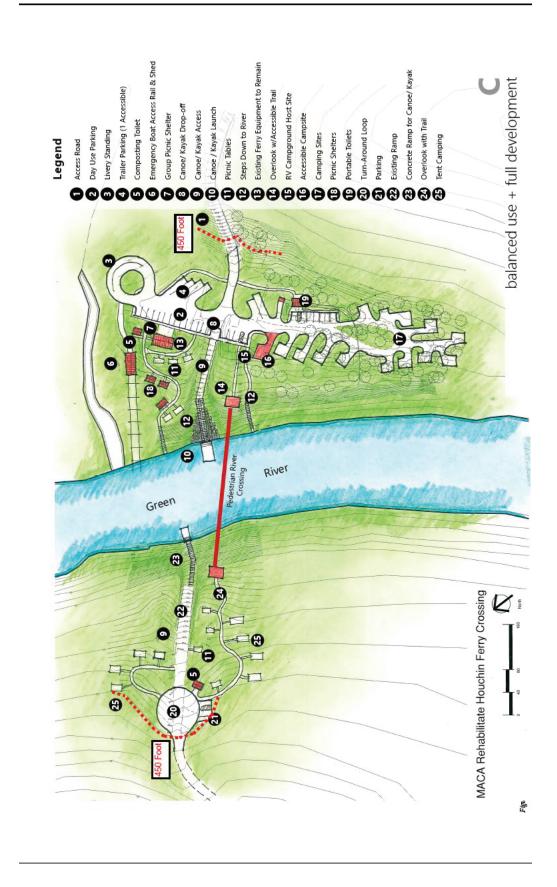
Site Schematic of Preferred Alternative Showing 450-Foot Flood Elevation (100-year flood is 459 feet)
